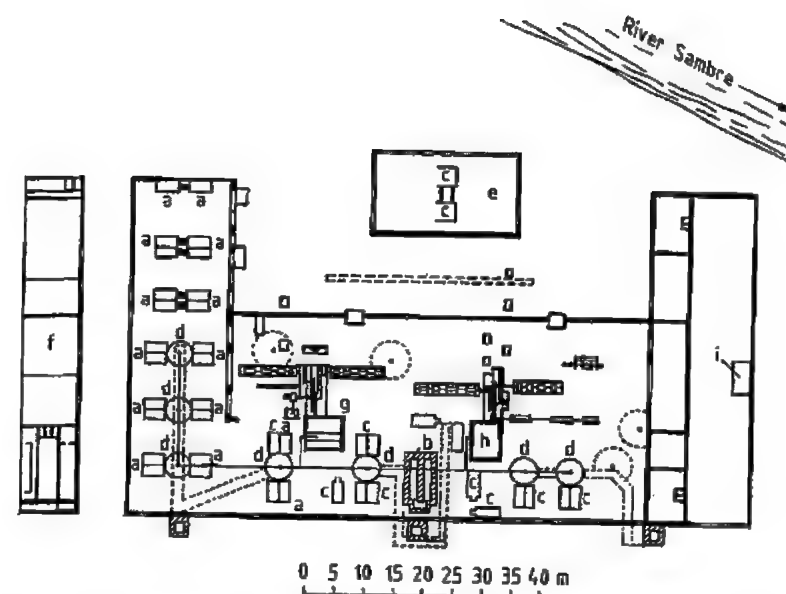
Ground plan of rolling mill at Couillet (1835) [15]: a) Puddling furnace; b) Coal-fired boiler; c) Welding furnaces; d) Waste heat boilers; e) Finishing drop; f) Workshops; g) Machine 1; h) Machine 2; i) Stores.
